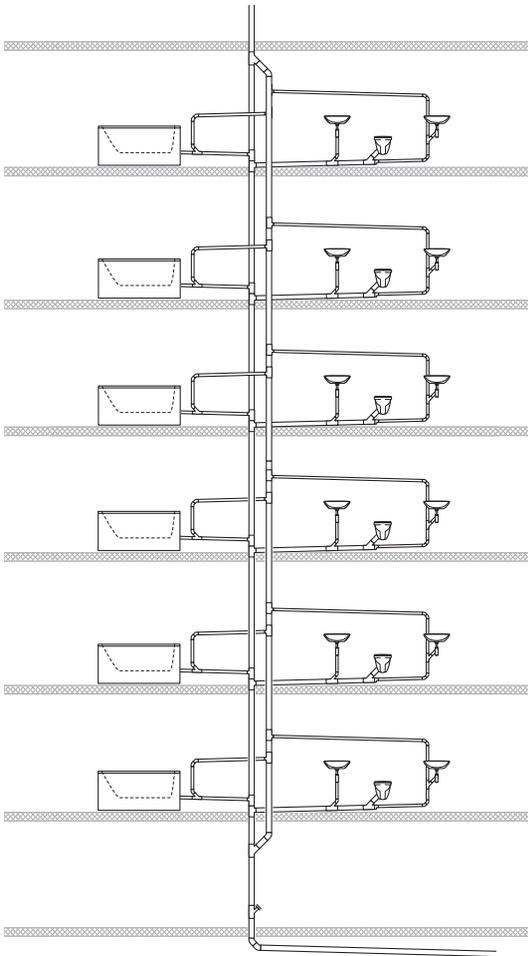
Drainage system with branch ventilation of the branch discharge pipes
